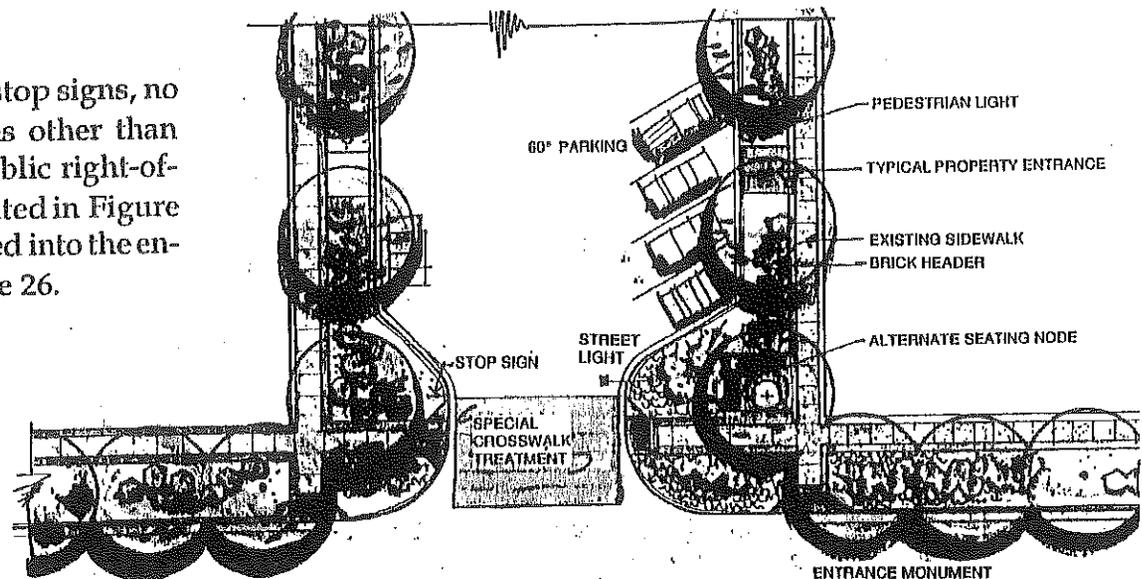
; Typical Residential/Pedestrian Scale Entrance Monument Plan
